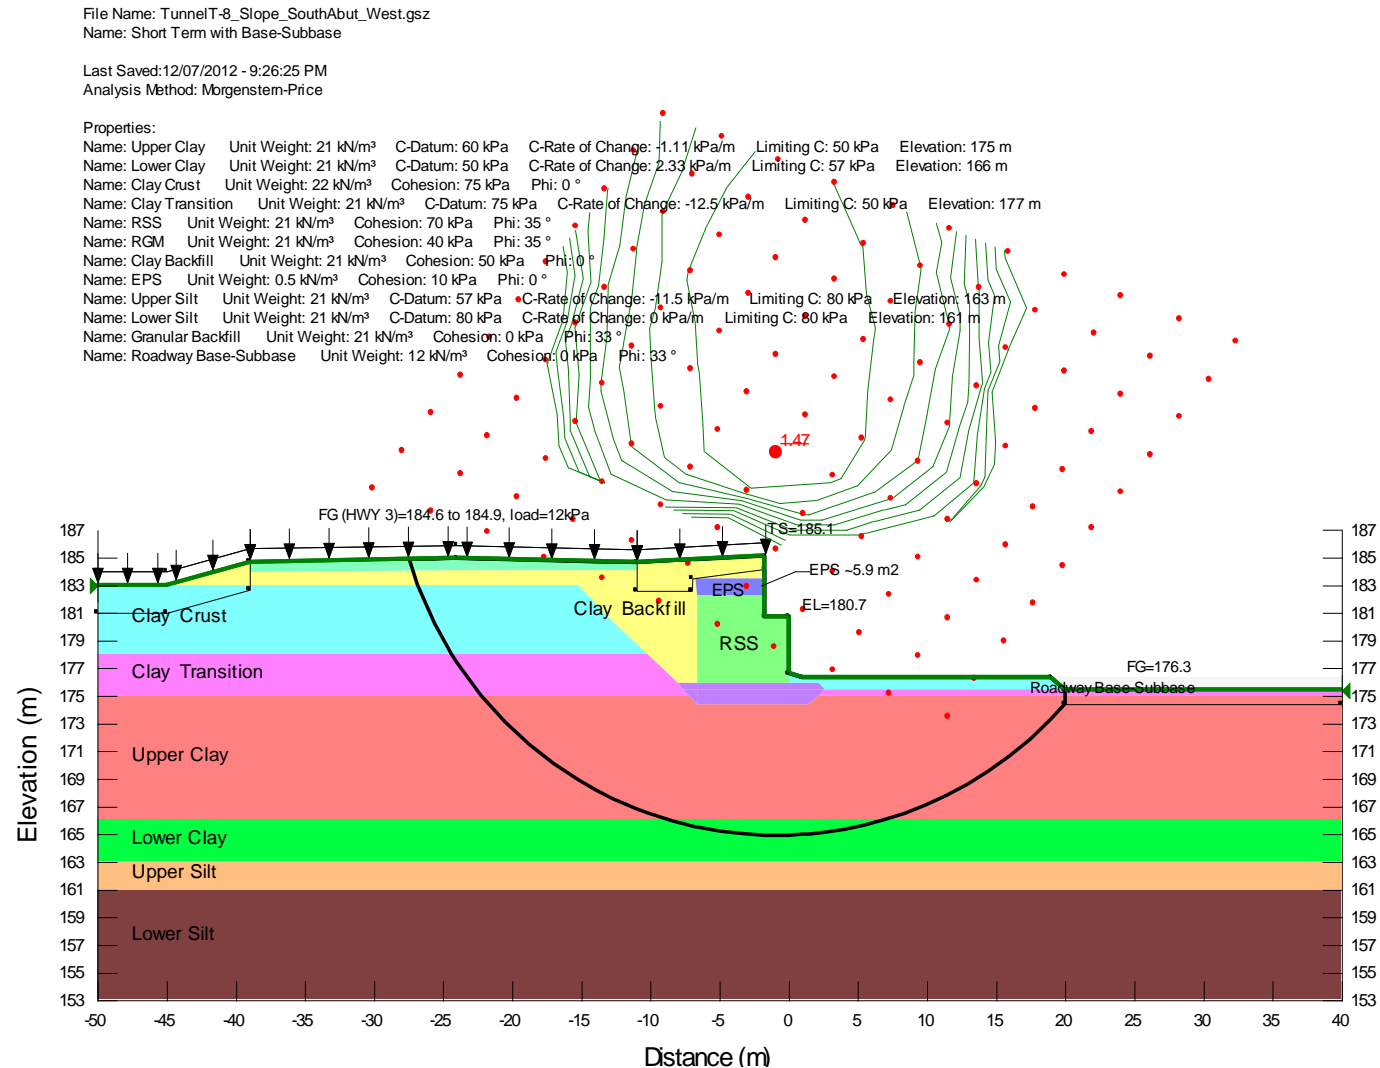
Global Stability Result – South Abutment (West Segment) – End of Construction (Undrained) Loading
